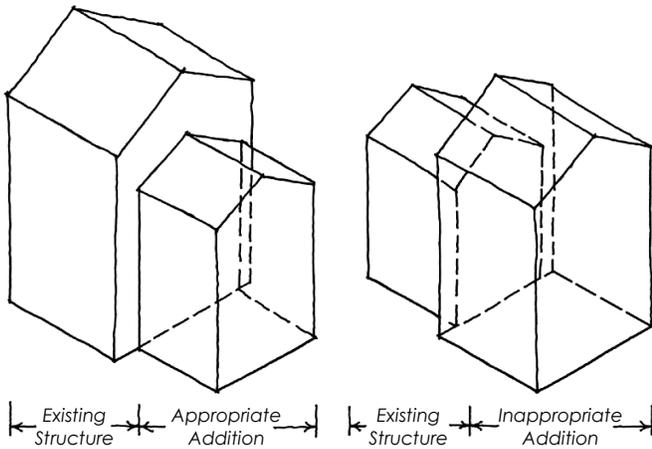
An addition to a historic building should be a secondary form that preserves the form of the historic building. A proposed addition should be no larger than two-thirds the street frontage of an existing building.
